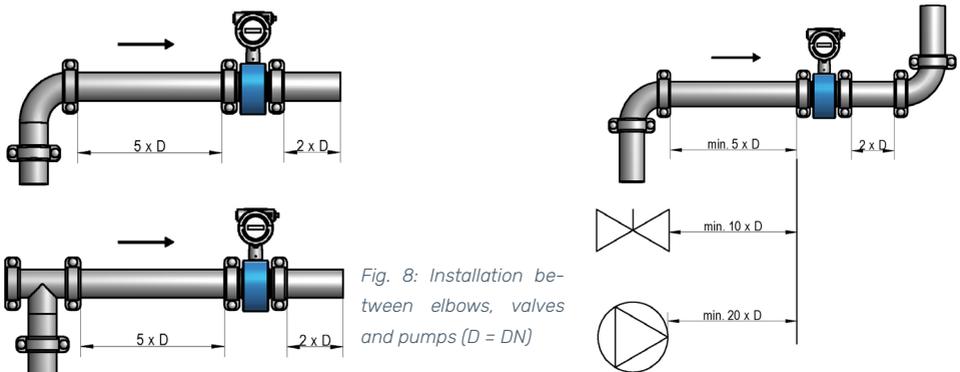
Installation between elbows, valves and pumps ($D = DN$)
